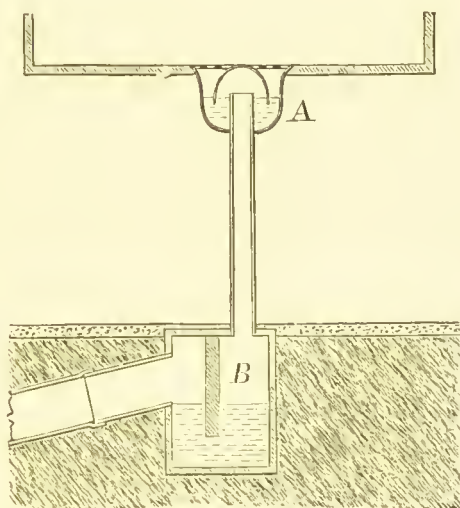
SINK WITH DOUBLE-TRAPPED WASTE PIPE.
